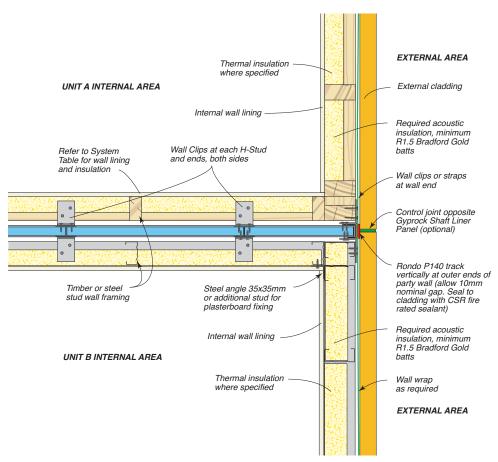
Junction Of Party Wall And External Wall With Cemintel Territory Series Cladding - Plan View
